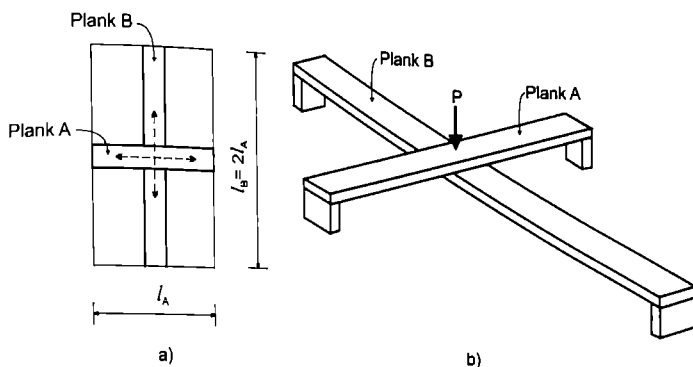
Two-way load path example: timber planks with the same stiffness on rigid supports: a) plan view, and b) isometric view.
